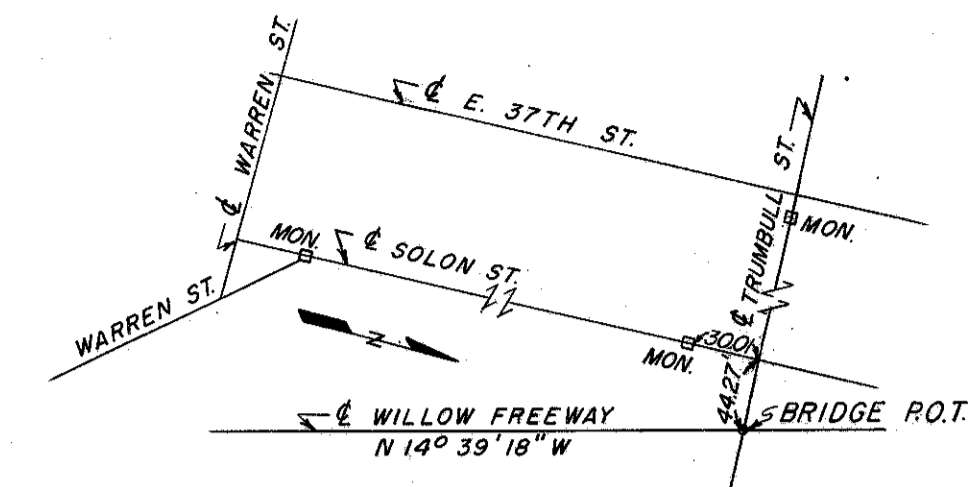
PLAN - PROFILE O.P.R. & R.E. STANDARD
